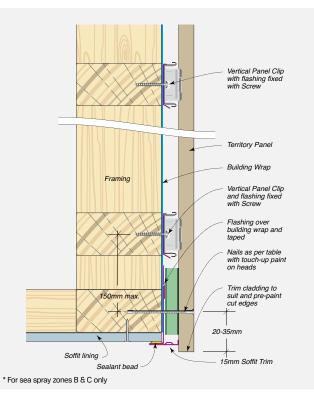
Soffit Detail – With Timber Trim – Elevation
